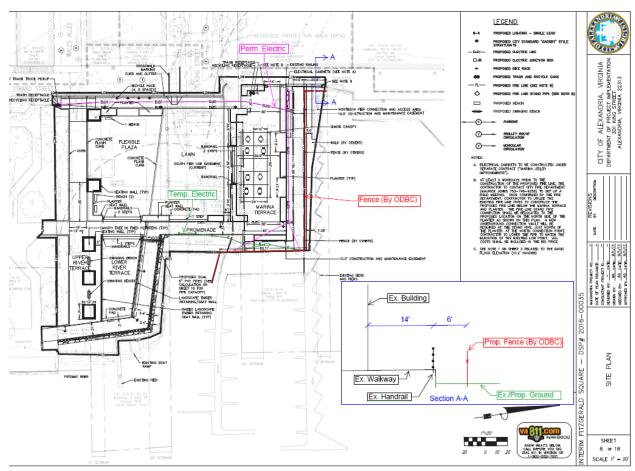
King Street Waterfront Park: City's final site plan drawing showing electrical and ODBC fence.
